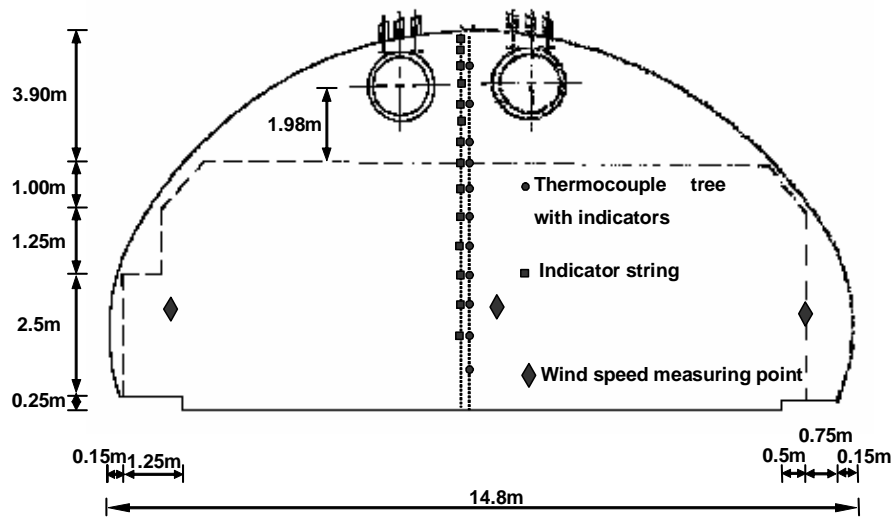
Cross-sectional view of the *Yangzong Road Tunnel* (not to scale).
